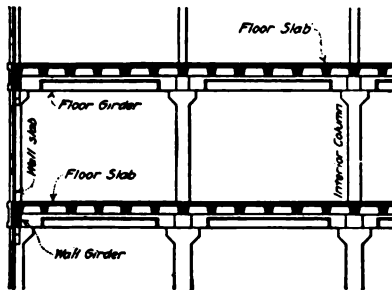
Part section of building on the *Unit-bilt* system of reinforced-concrete construction.
